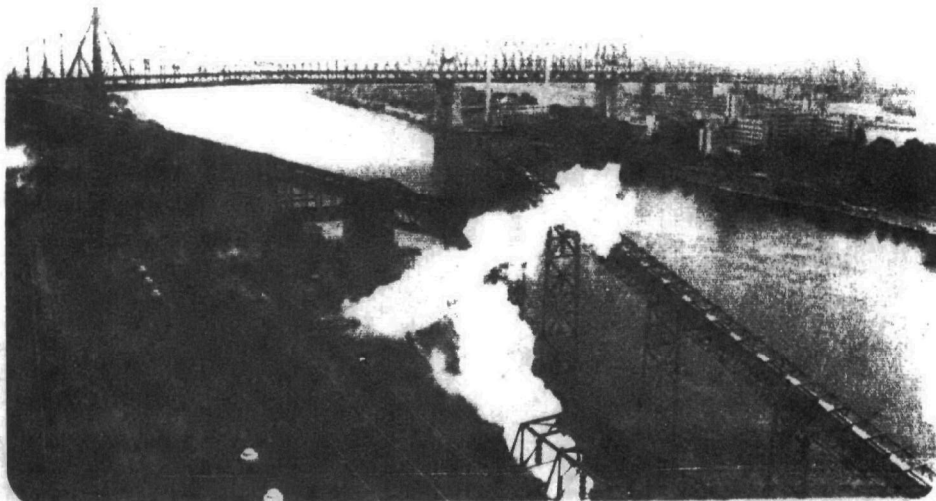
View from the boiler house roof facing south-southwest. The coal crusher house is shown in the center of the photo. To its right and left, respectively, are shown coal conveyors A and B. The top half of the photo shows the 59th Street Bridge crossing the East River.
